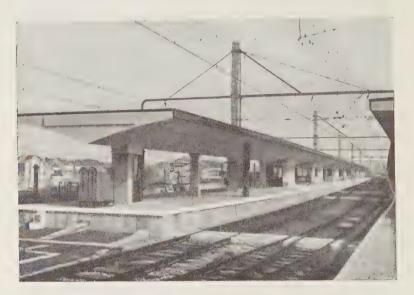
S. N. C. B.: Ferro-concrete platform roof at Brussels-North Station.
